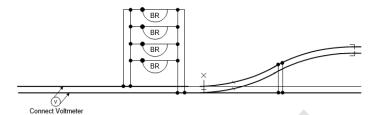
(a)-2: SCC Circuit Plan - Wiring Details
